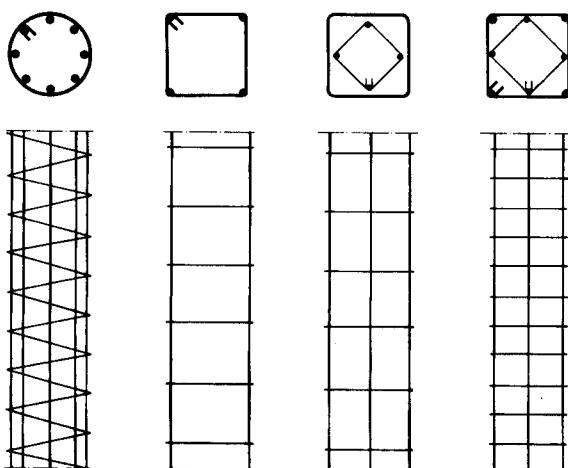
Reinforcements in concrete filled hollow section columns
